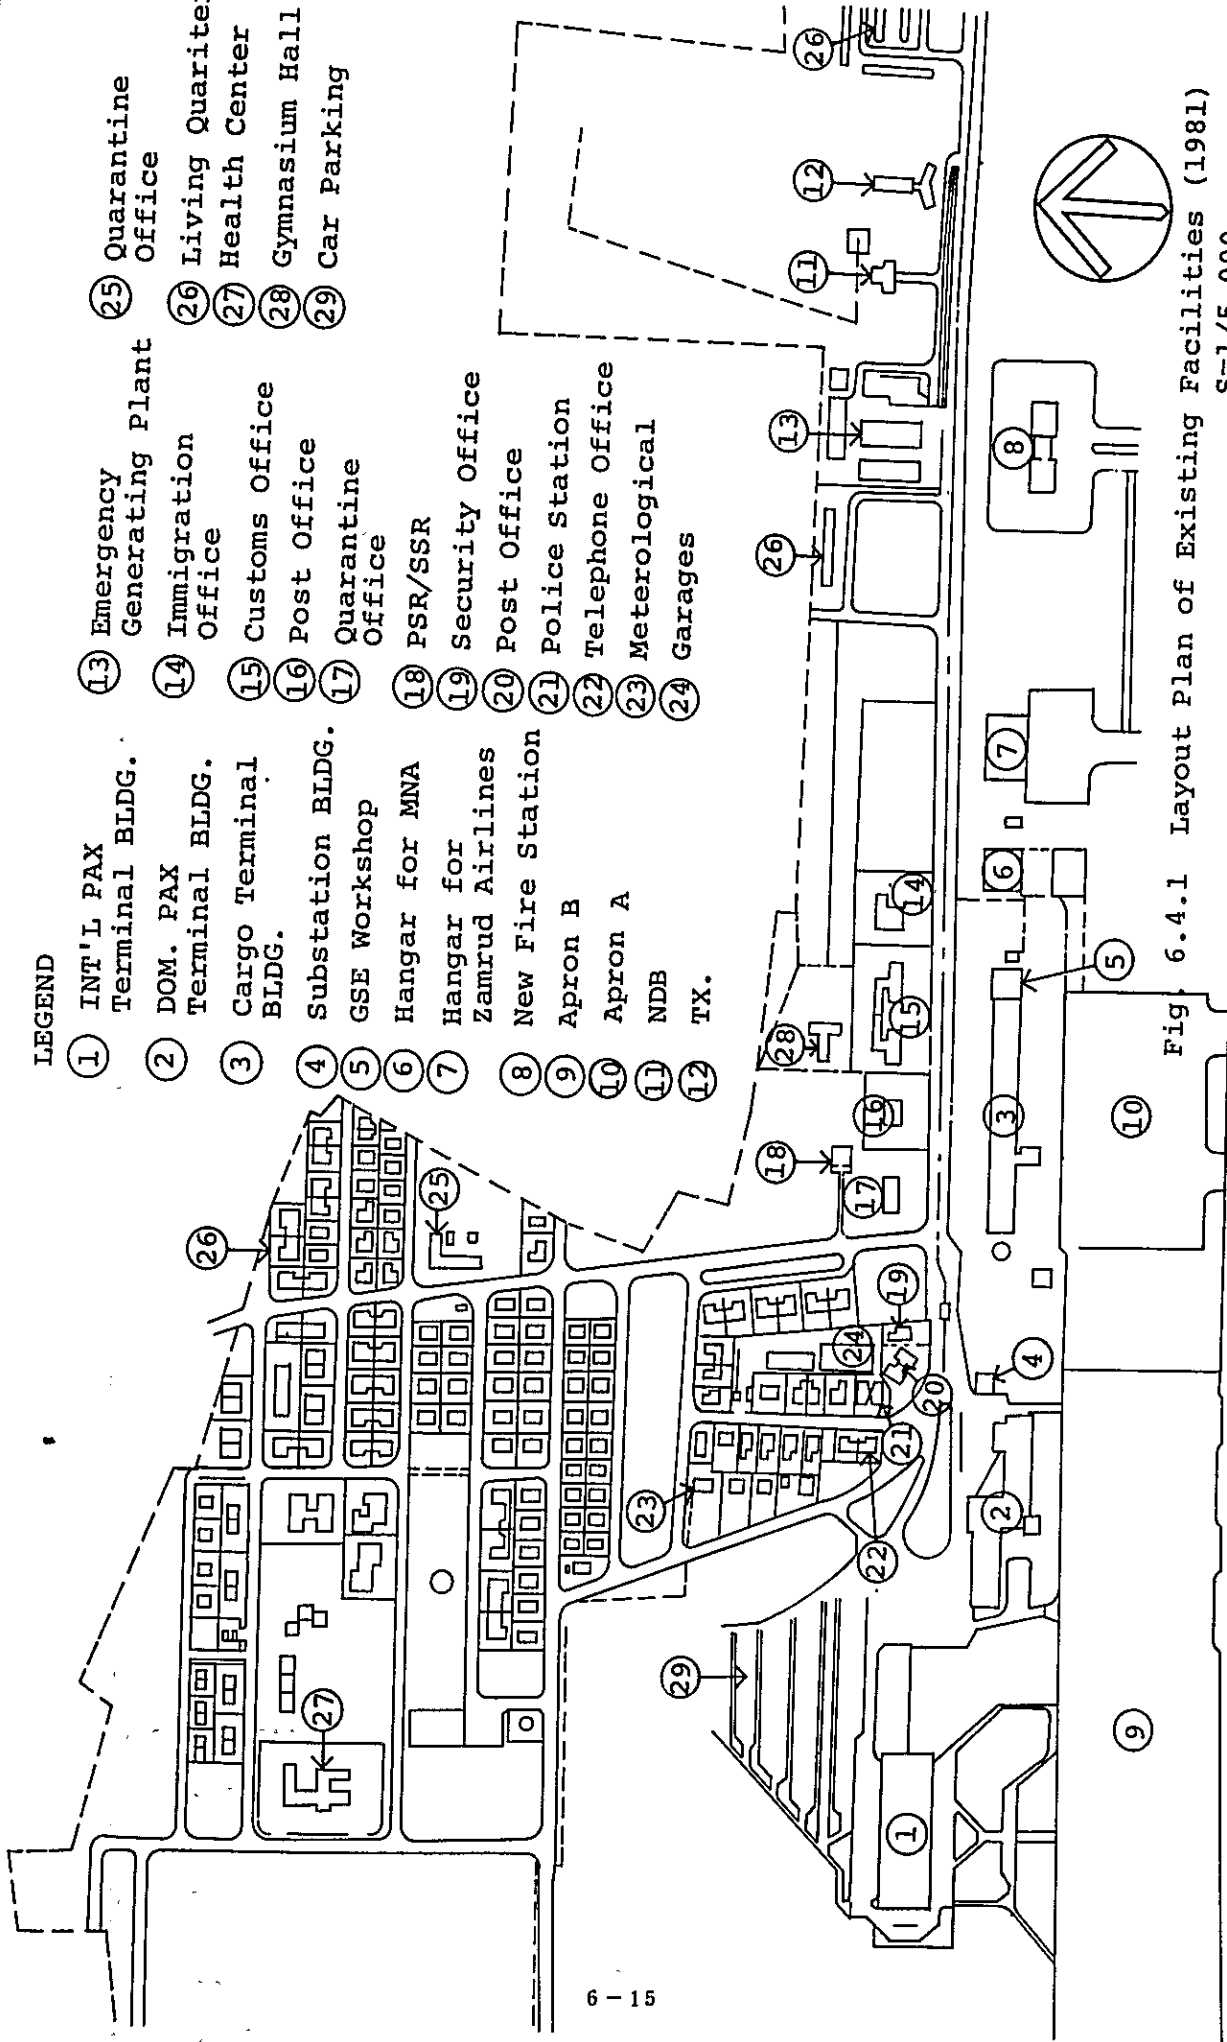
Layout Plan of Existing Facilities (1981)
